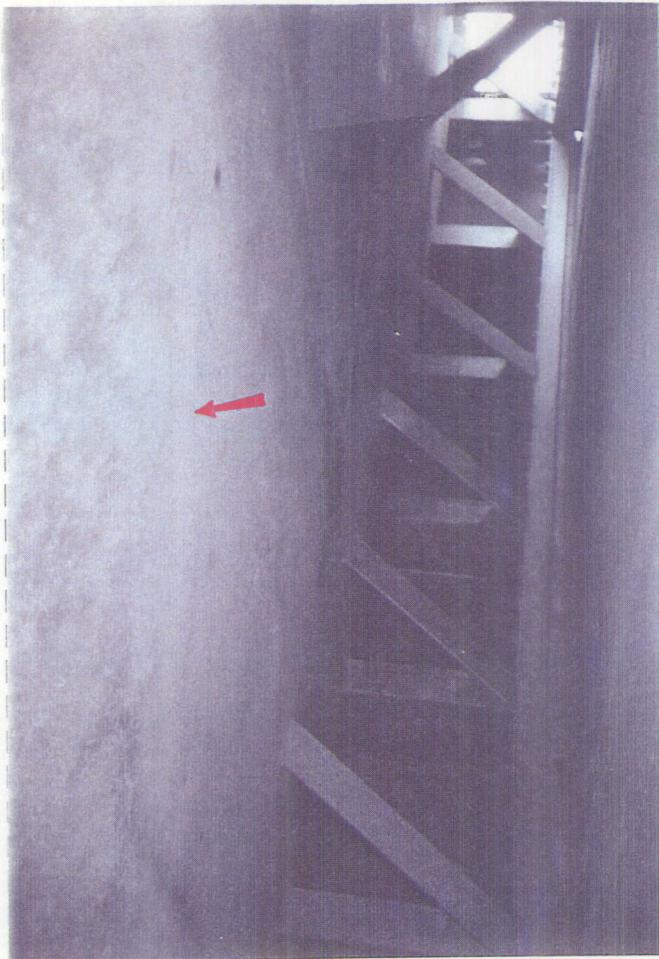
Morris Dam - 70' x 18' Drum Gate #2 - Left side of gate, viewed from d/s side of gate chamber. Cantilevered portion of u/s faceplate. Note end plates on drum gate in good condition, bracing in good condition, but pitted. Looking towards top. Lift is hatch to spillway. - (9/10/98).
